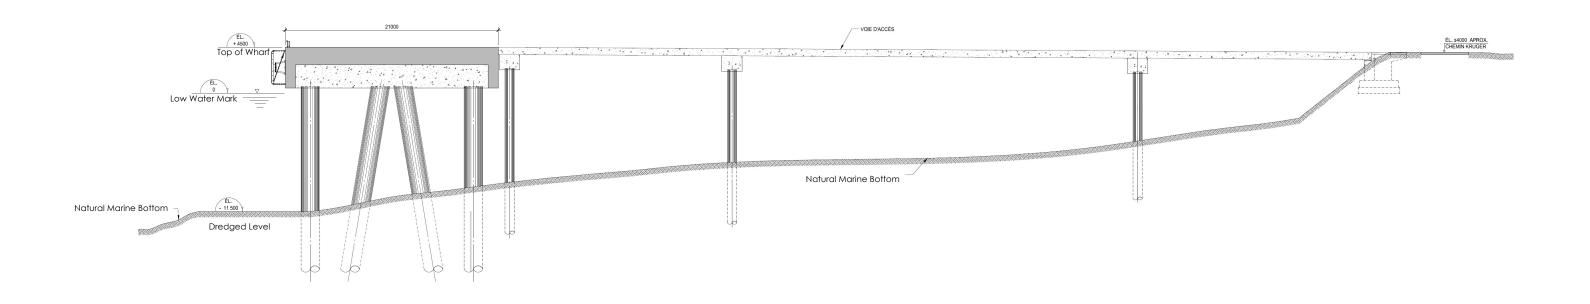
Cross-Section - Option 3 Slab on Pile with an access bridge and no storage
